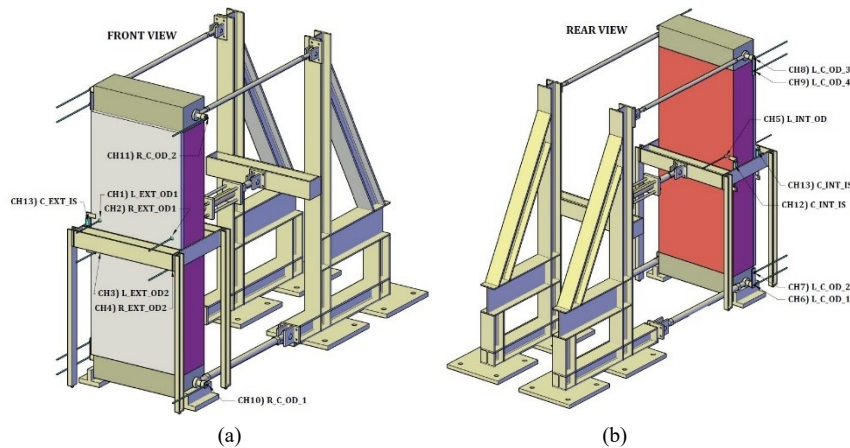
Front (a) and rear (b) view of the three-point bending test setup
